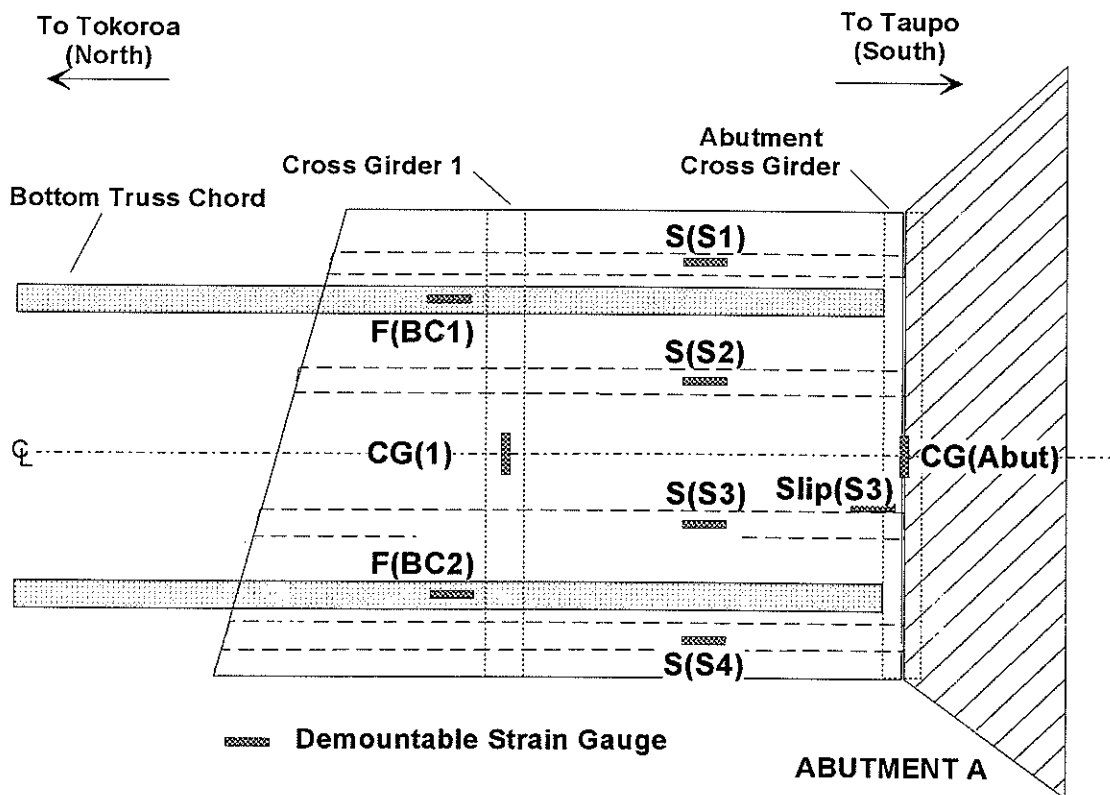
Instrumentation plan for Atiamuri Bridge.
